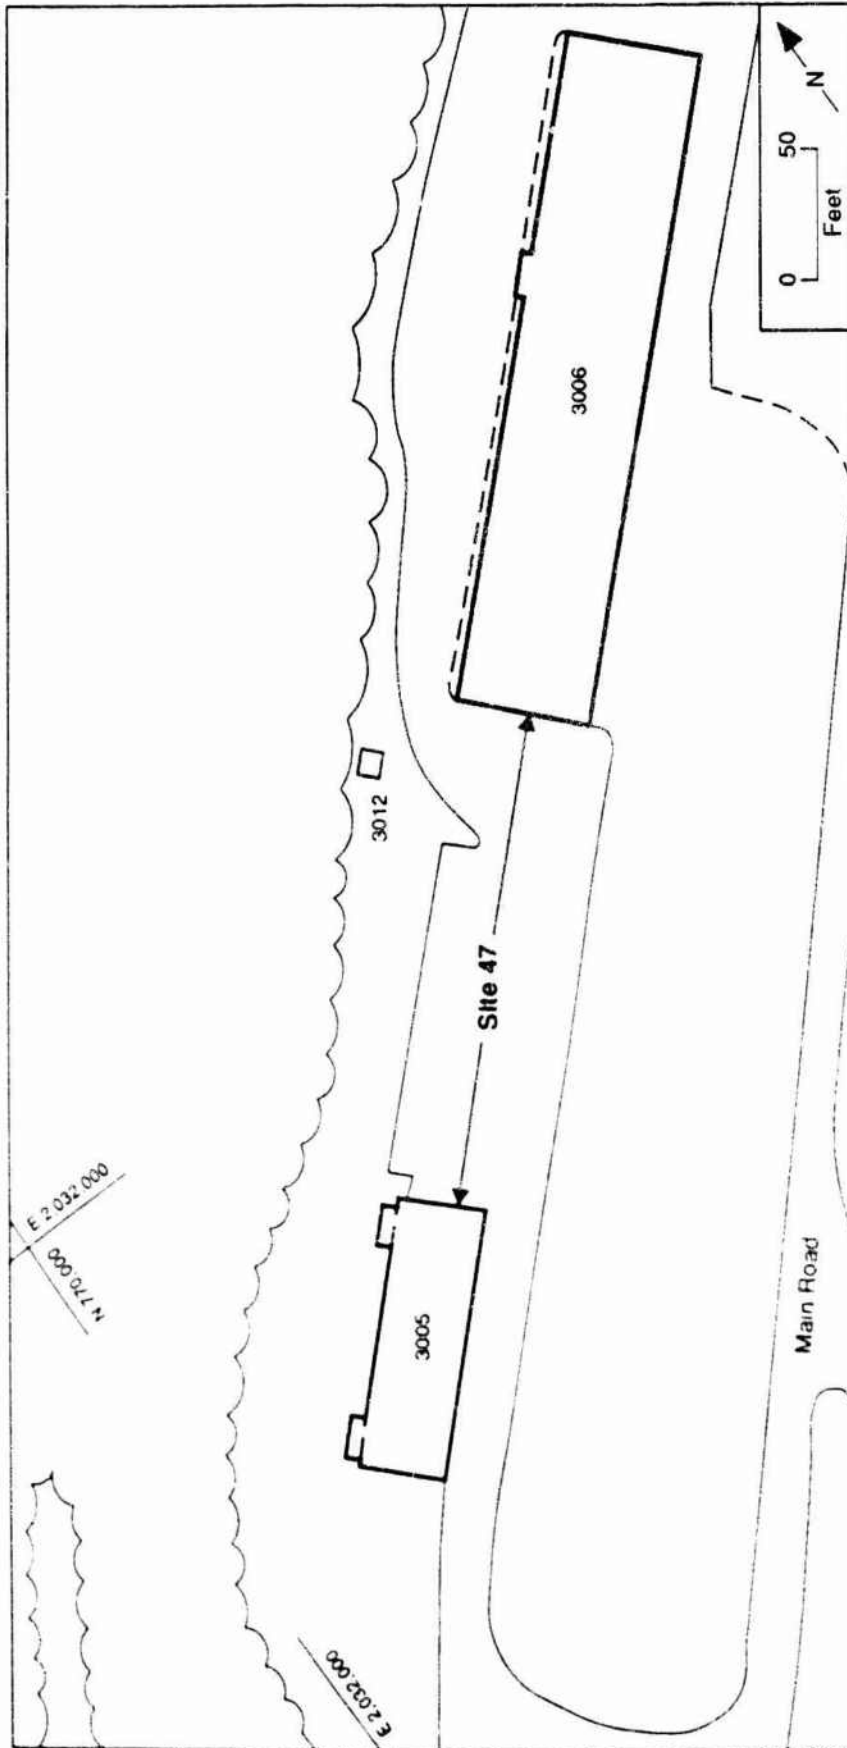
Layout of Buildings 3005 and 3006 at Site 47 (Source: Adapted from USAACE 1984b)
